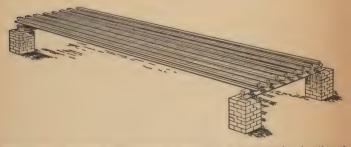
Manure incincerator consisting of grid made of railroad rails elevated on brick piers.
